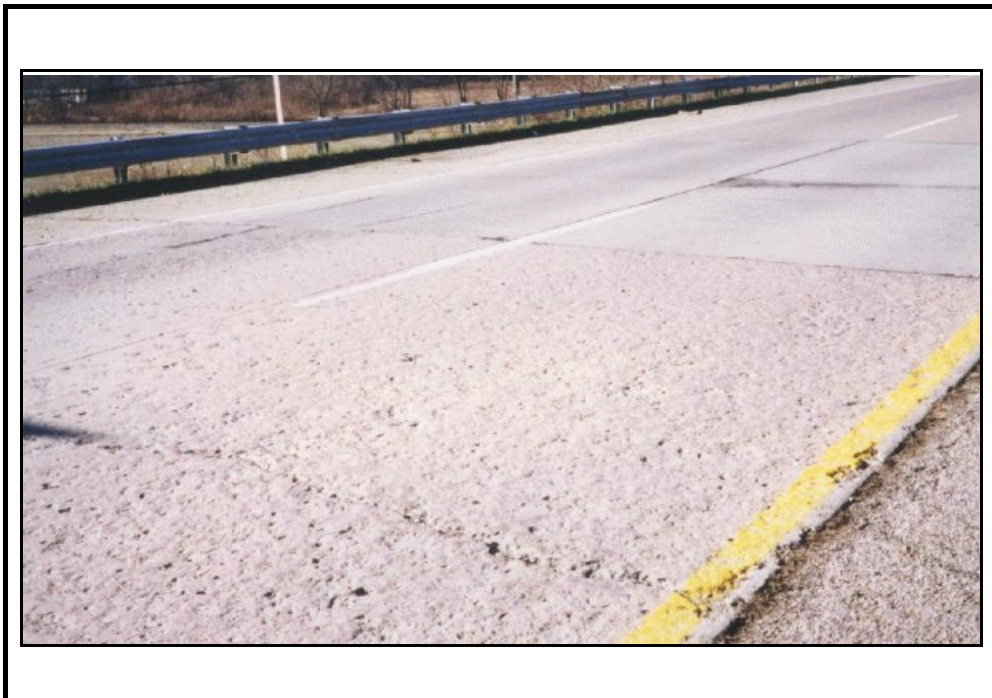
Surface Deterioration in Jointed Concrete Pavement, High Severity
